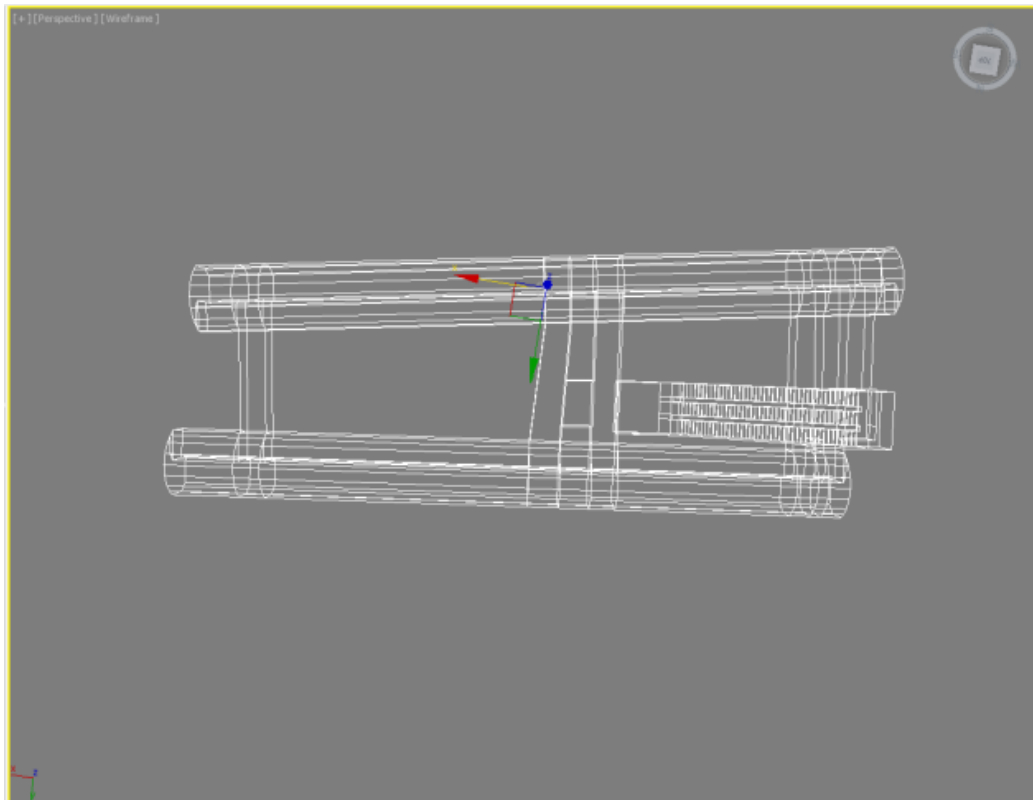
Polygon frame Model of the East-West platforms (plan elevation)
